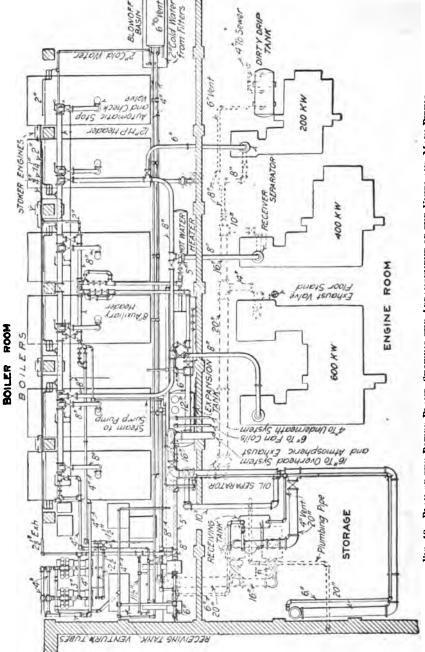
PLAN OF THE POWER PLANT, SHOWING THE ARRANGEMENT OF THE UNITS AND MAIN PIPING.
